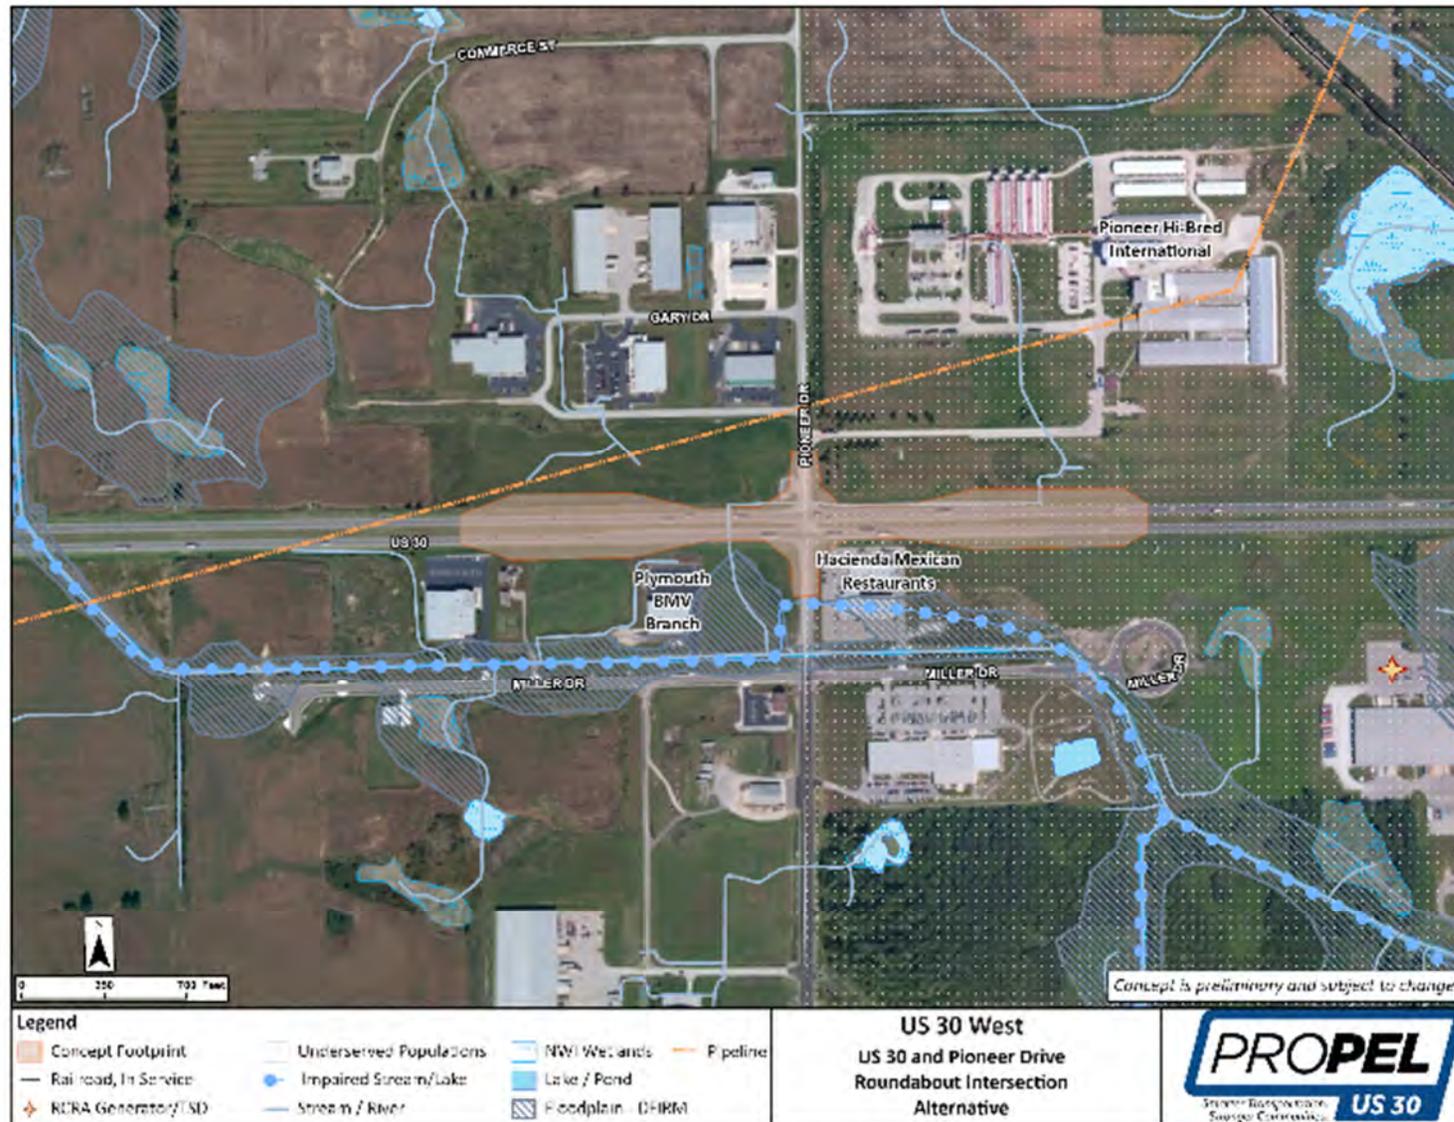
US 30 and Pioneer Road – Roundabout Alternative
